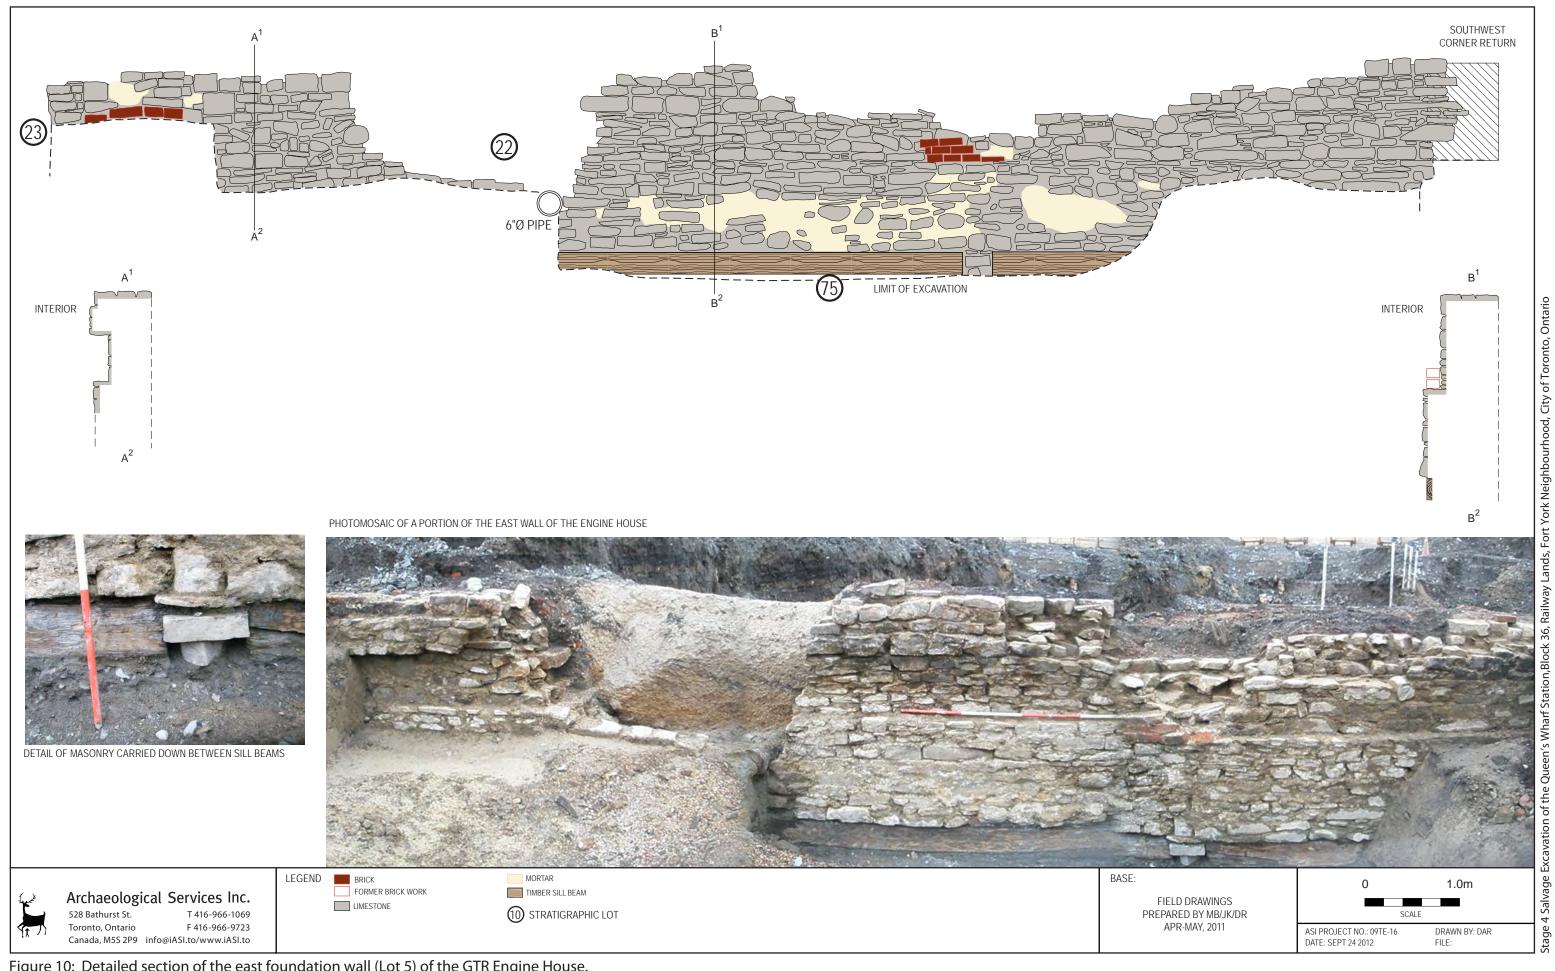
Detailed section of the east foundation wall (Lot 5) of the GTR Engine House.
